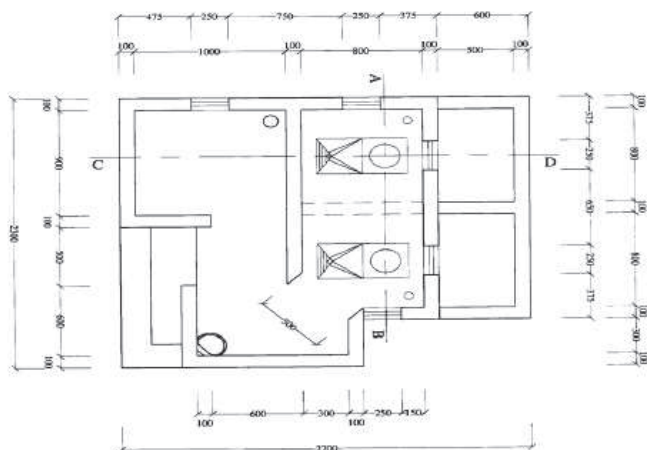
Drawing of a household UDDT with a shower cubicle on the left (source: PAARSS).
